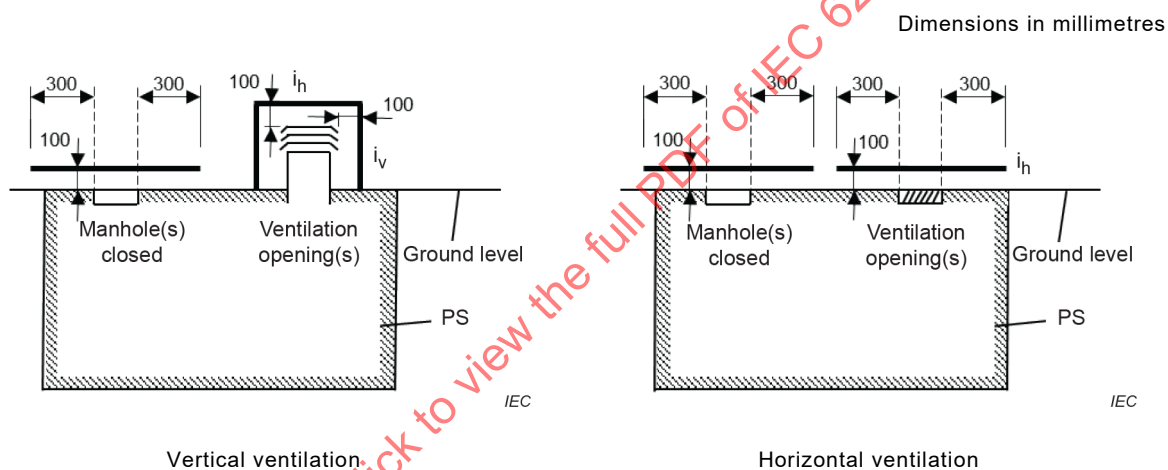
i – Protection of general public around a walk-in type and non-walk-in type underground prefabricated substation (closed doors)
